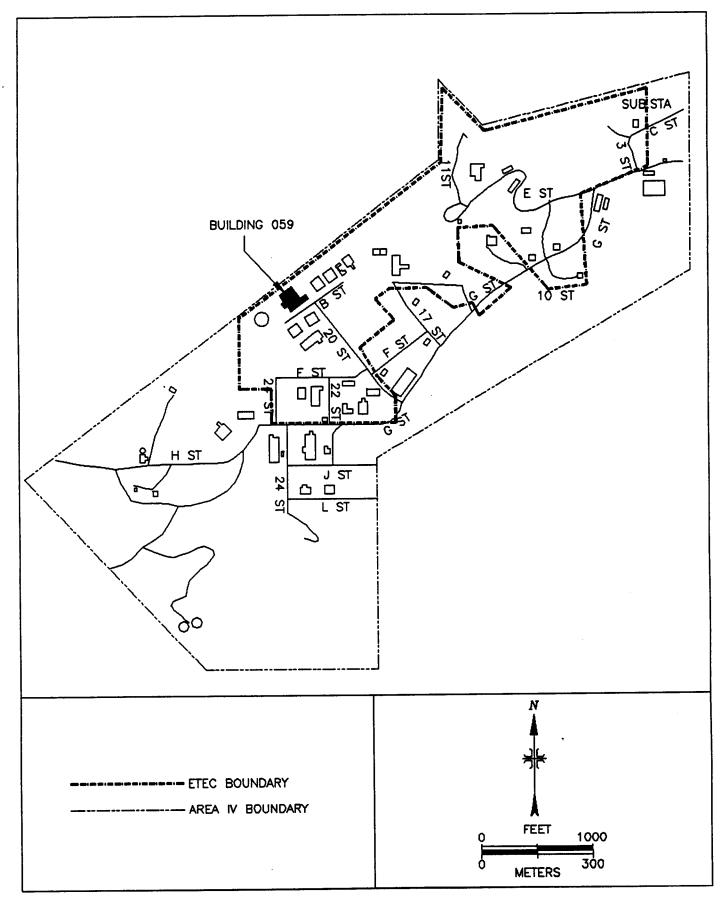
Santa Susana Field Laboratory Area IV, Plot Plan — Location of Building 059
